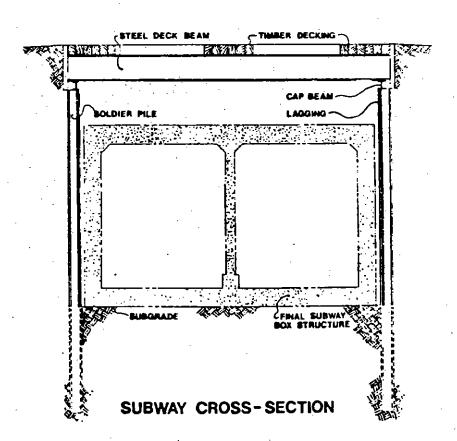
Typical cross section showing cut and cover subway construction. The concrete subway "box" is about 35 feet wide and 22 feet high. The average depth of excavation was about 40 feet.
